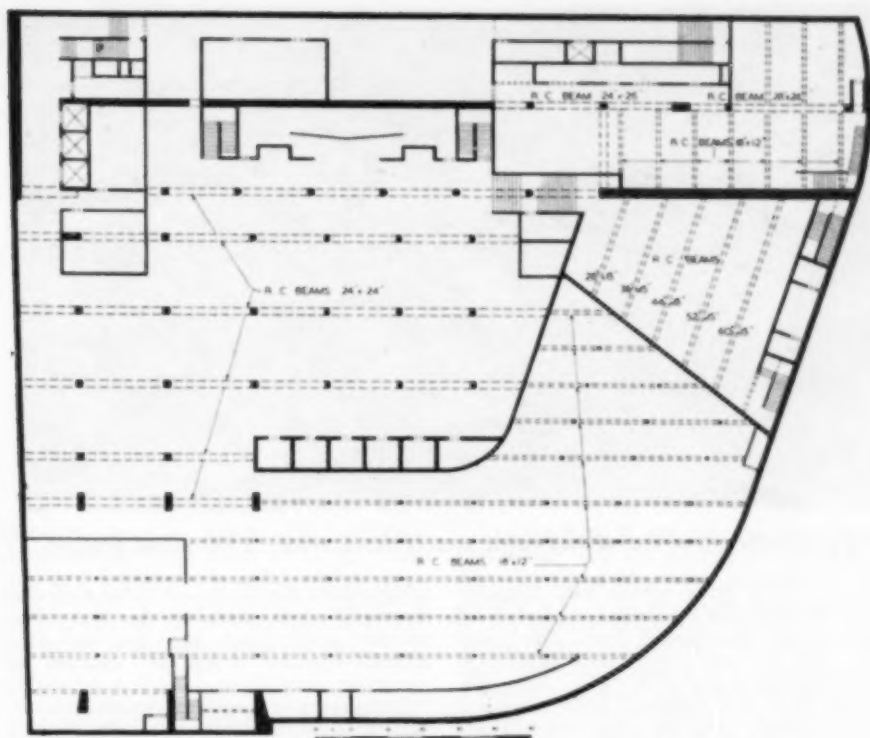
Plan of Basement of Omnibus Station, showing Ground-Floor Beams.
